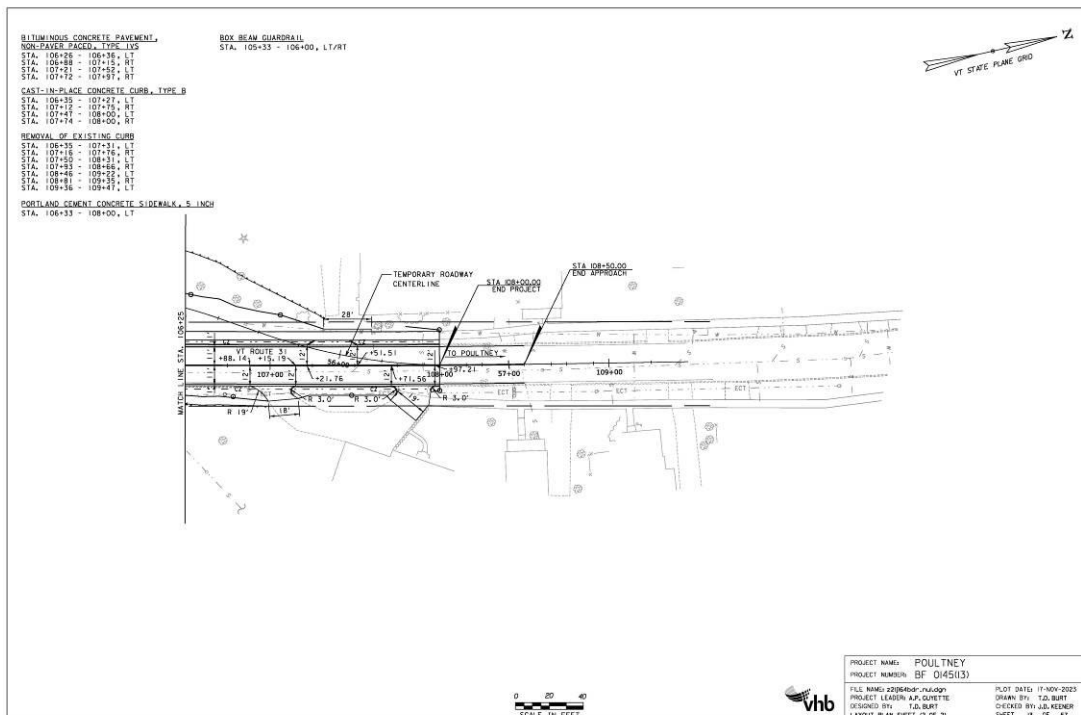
Layout Plan Sheet 2 of 2, Preliminary Plans, November 2023.
